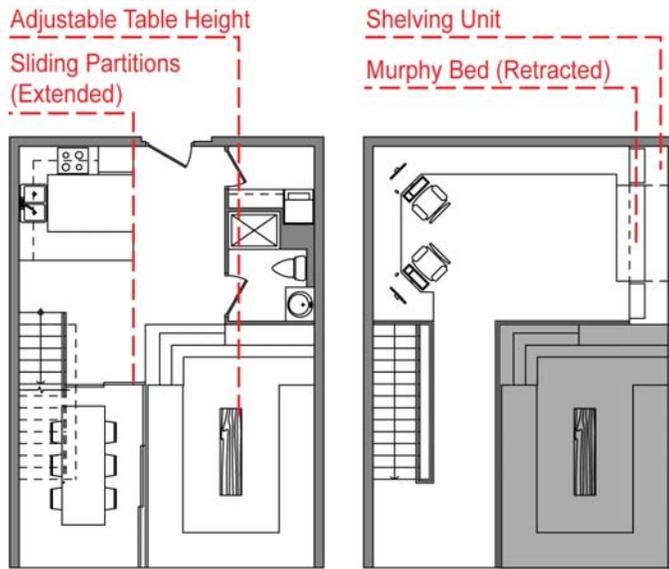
Possible Second Floor Addition (Work Arrangement)
